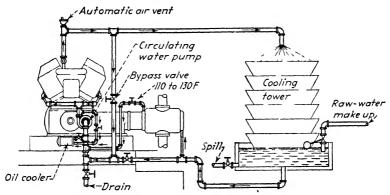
Cooling-tower recirculating system is not recommended. (Courtesy of Ingersoll-Rand Co.)
